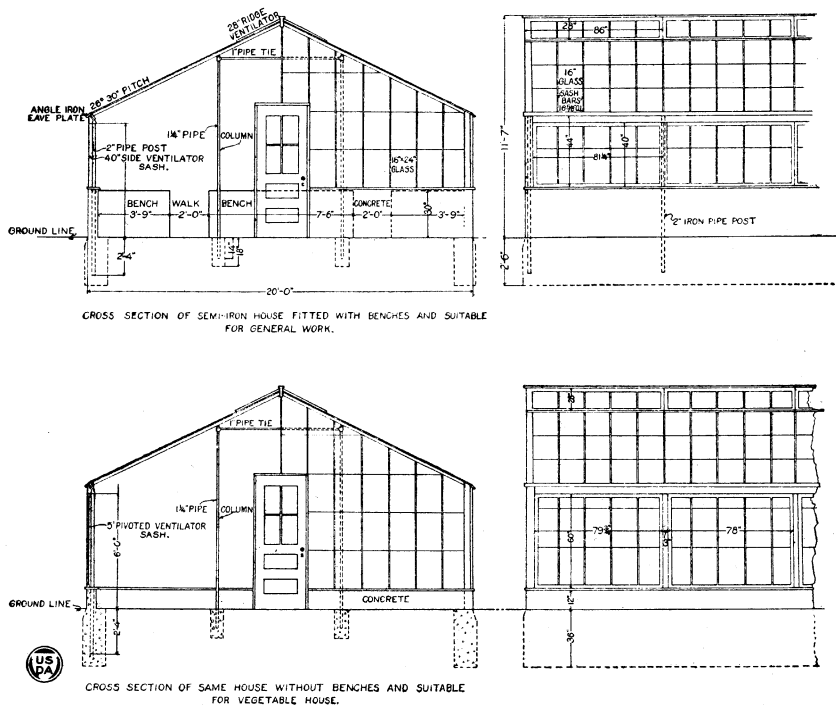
A 20-foot pipe-post, angle-iron, eave-plate house suitable for the production of either flowers or vegetables.
